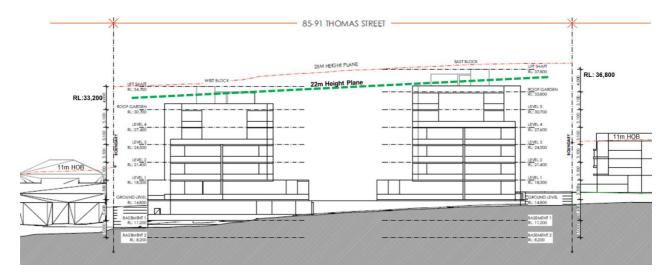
Section facing north from Parramatta River with adjacent properties (Source: PTI Architecture)
